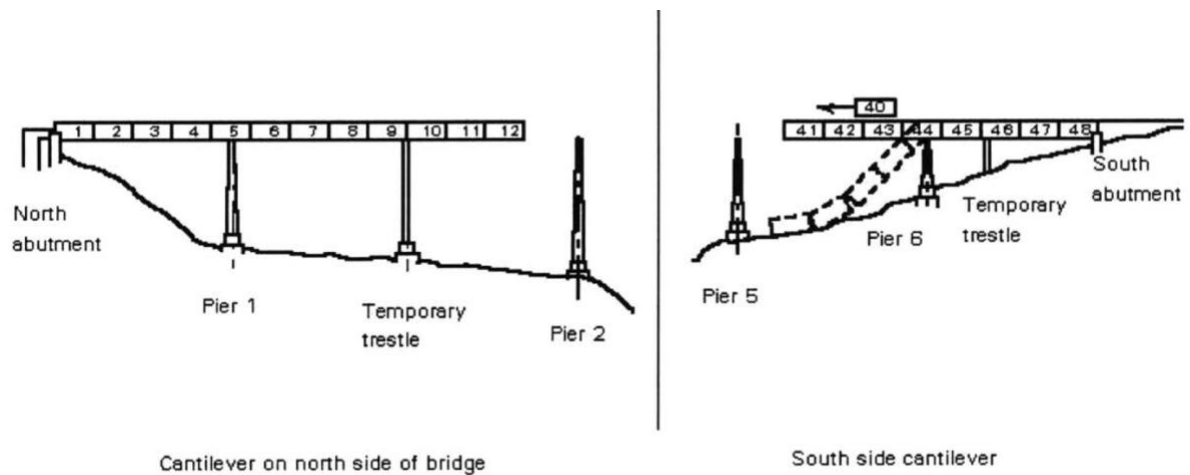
Schematic diagram of Cleddau Bridge construction and its failure.
